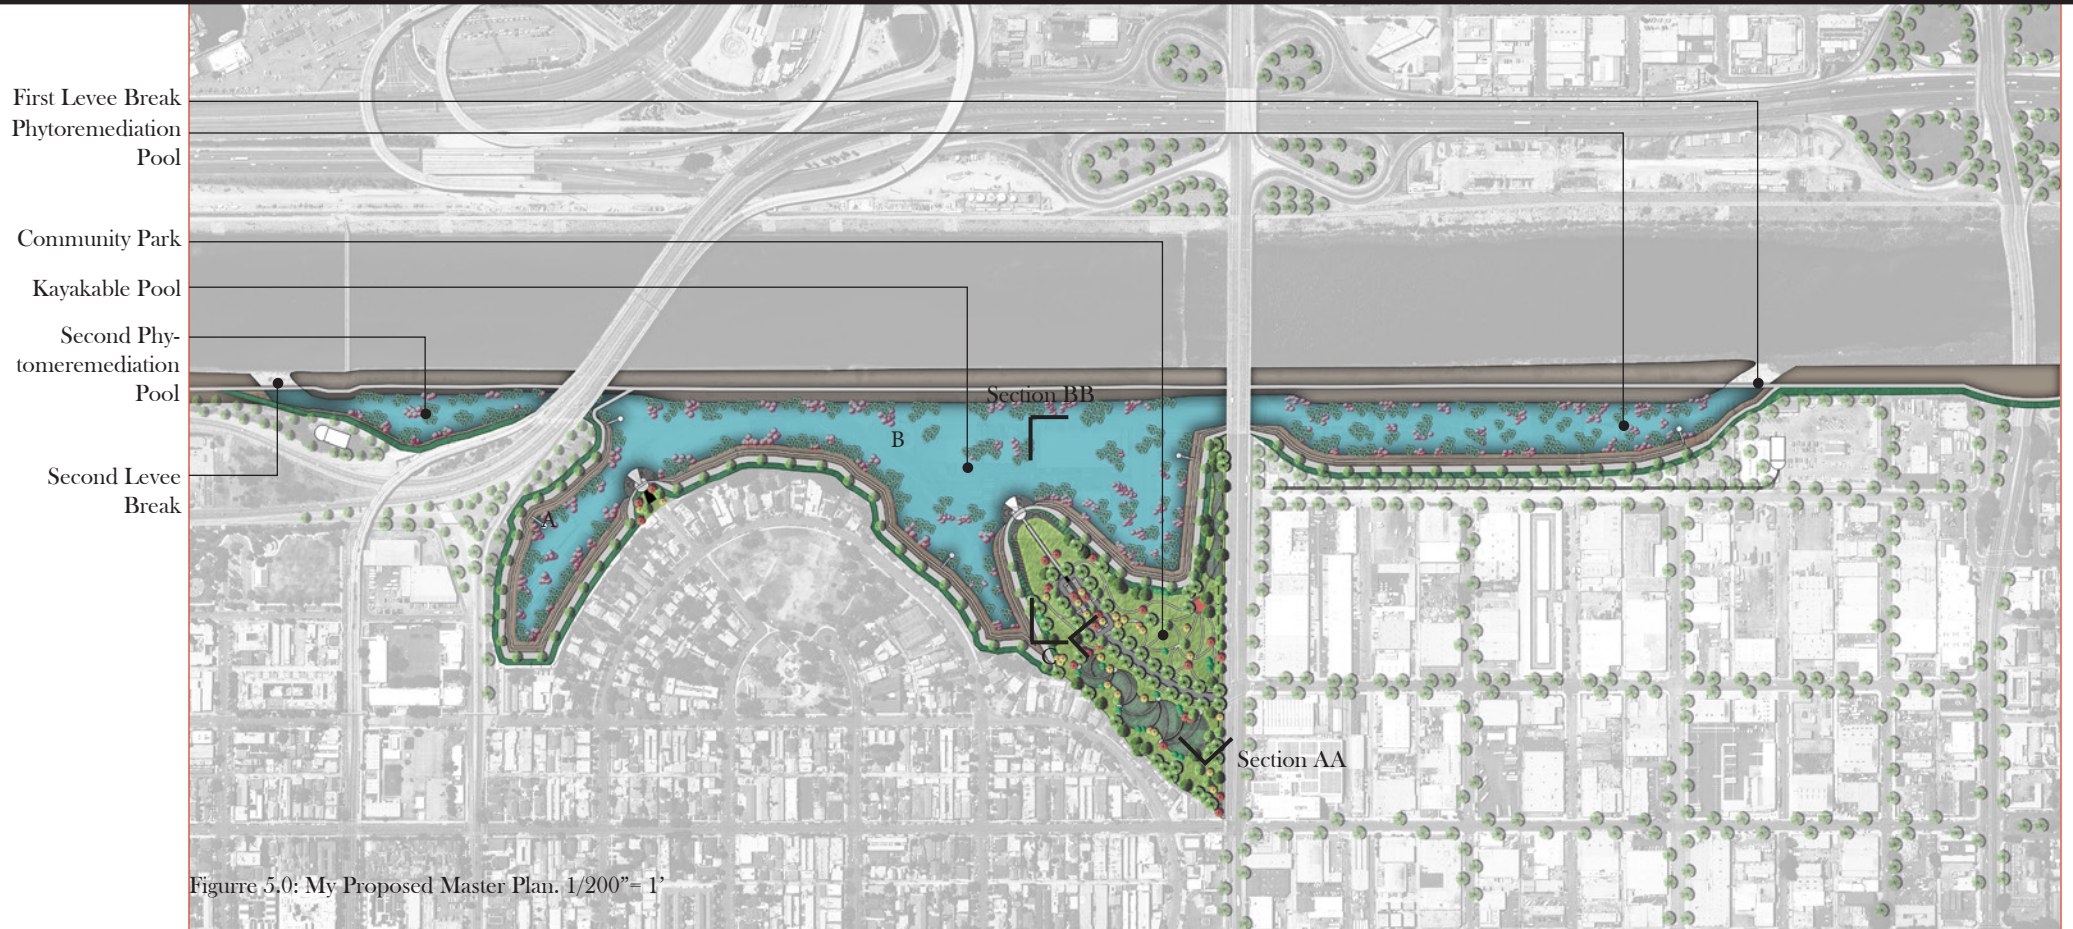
My Proposed Master Plan. 1/200" = 1'
